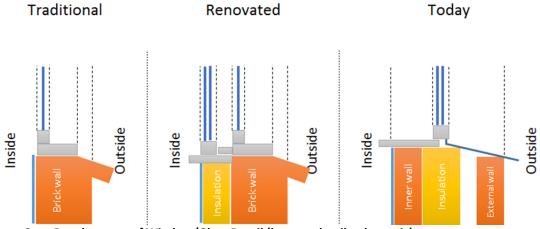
Development of Window/Glass Detail (bottom detail, schematic)
